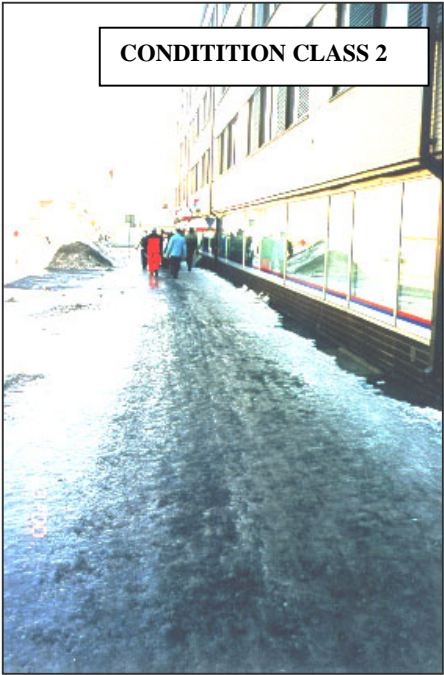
Extremely good pavement (sidewalk). Figure 8. Extremely poor pavement (sidewalk).
